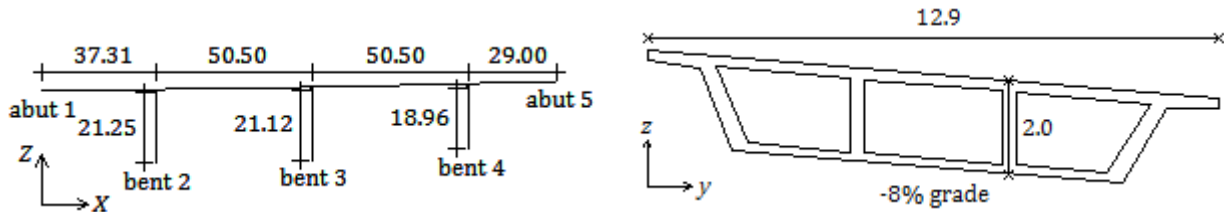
Penstock bridge: Elevation and girder cross-section (dimensions are in meters)
